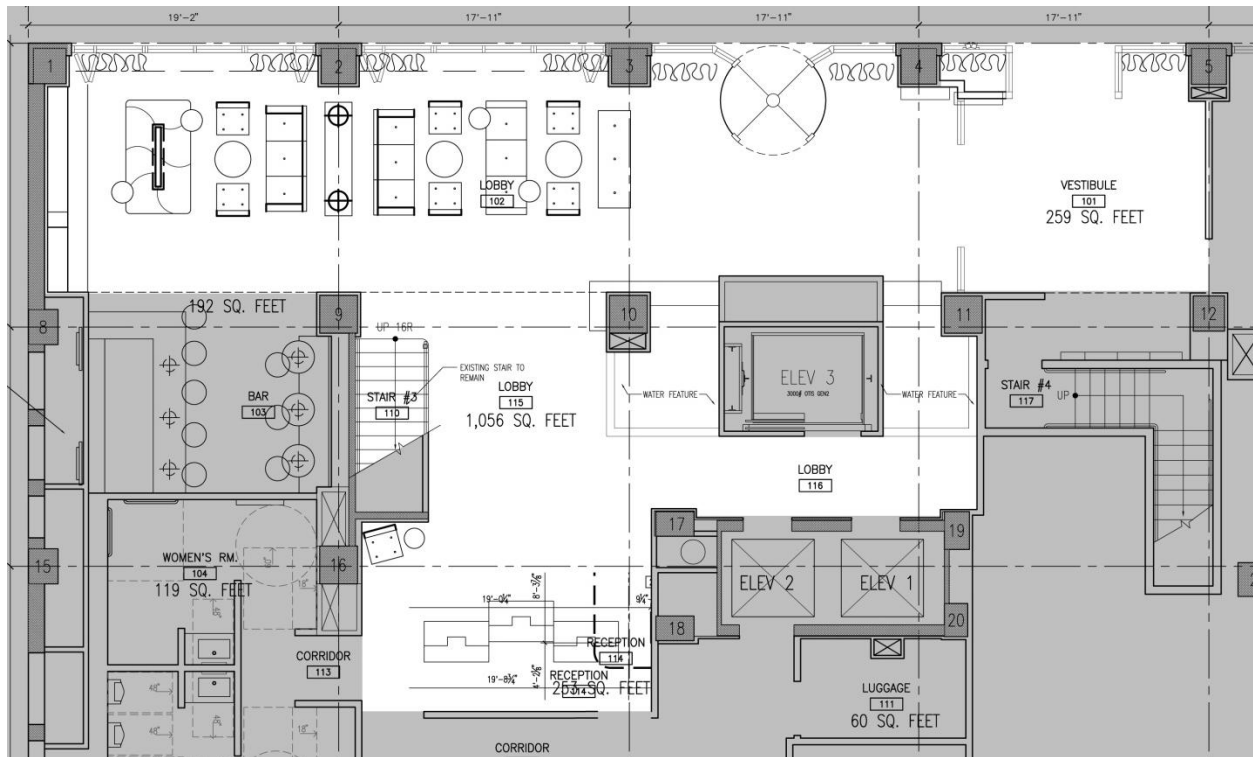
Entrance Lobby Ground Floor Plan (NTS)
